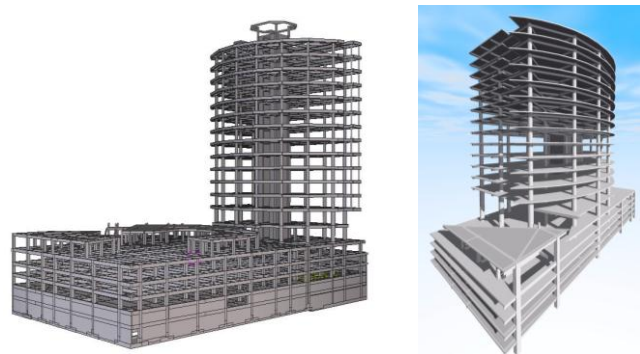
Isometric view of the WTCIII structural system. It consists of structural walls, combined with reinforced concrete frames, (dual system) with special ductile details in critical member zones.
